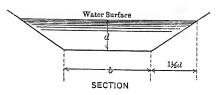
(Part 2 of 3).—Hydraulic Elements of Trapezoidal Sections.
